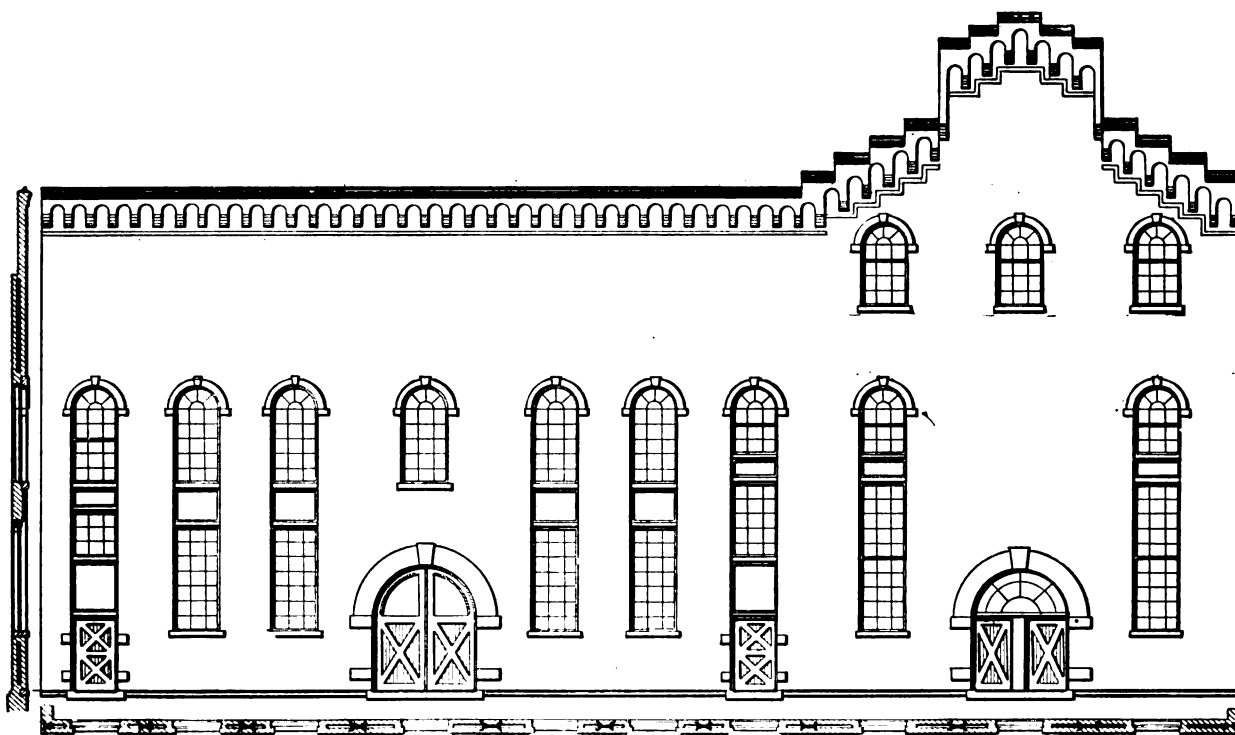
UNITED ELECTRIC LIGHT AND POWER CO.'S STATION.—FACADE.
